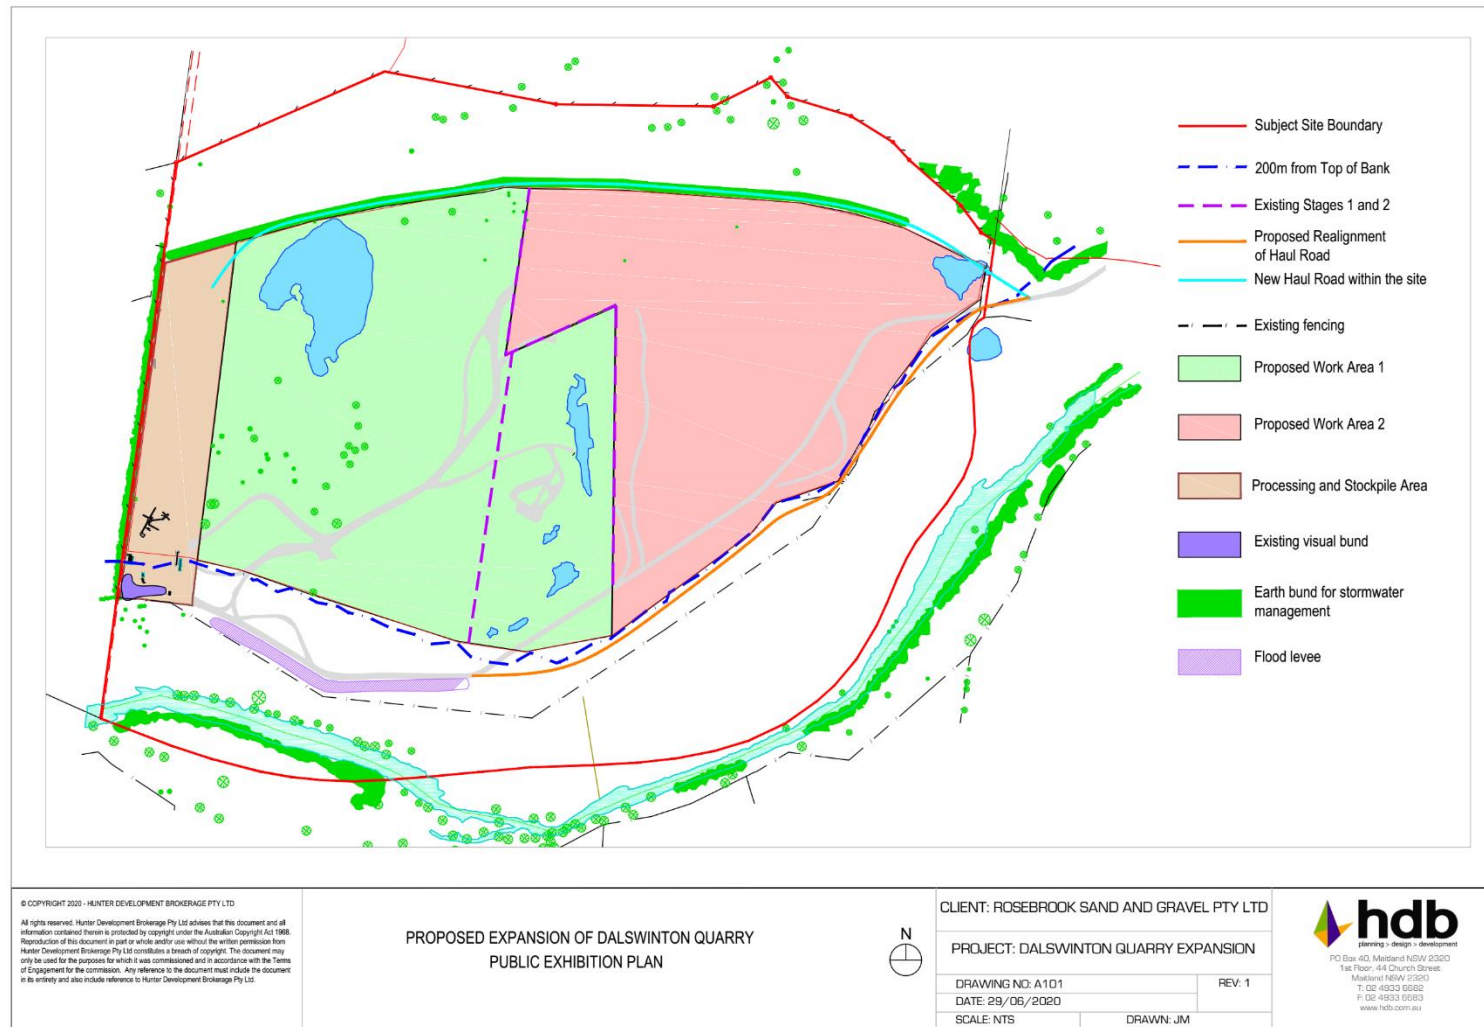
Main elements of existing operations and proposed expansion at Dalswinton Quarry. Source: HDB Town Planning & Design.
